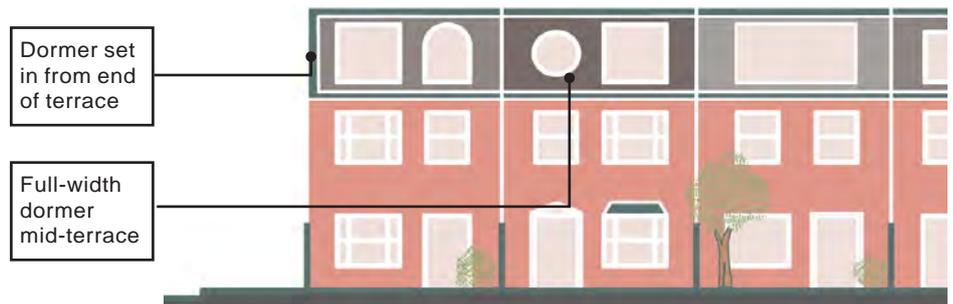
Dormers on a terraced houses that are full-width for mid-terrace houses, but set in from the edge of a gable end (or hipped roof) on the end of terrace house.
